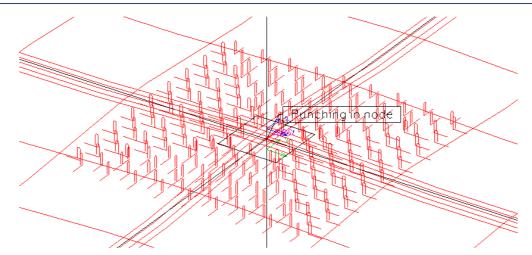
Converted shear reinforcement for punching to user reinforcement
